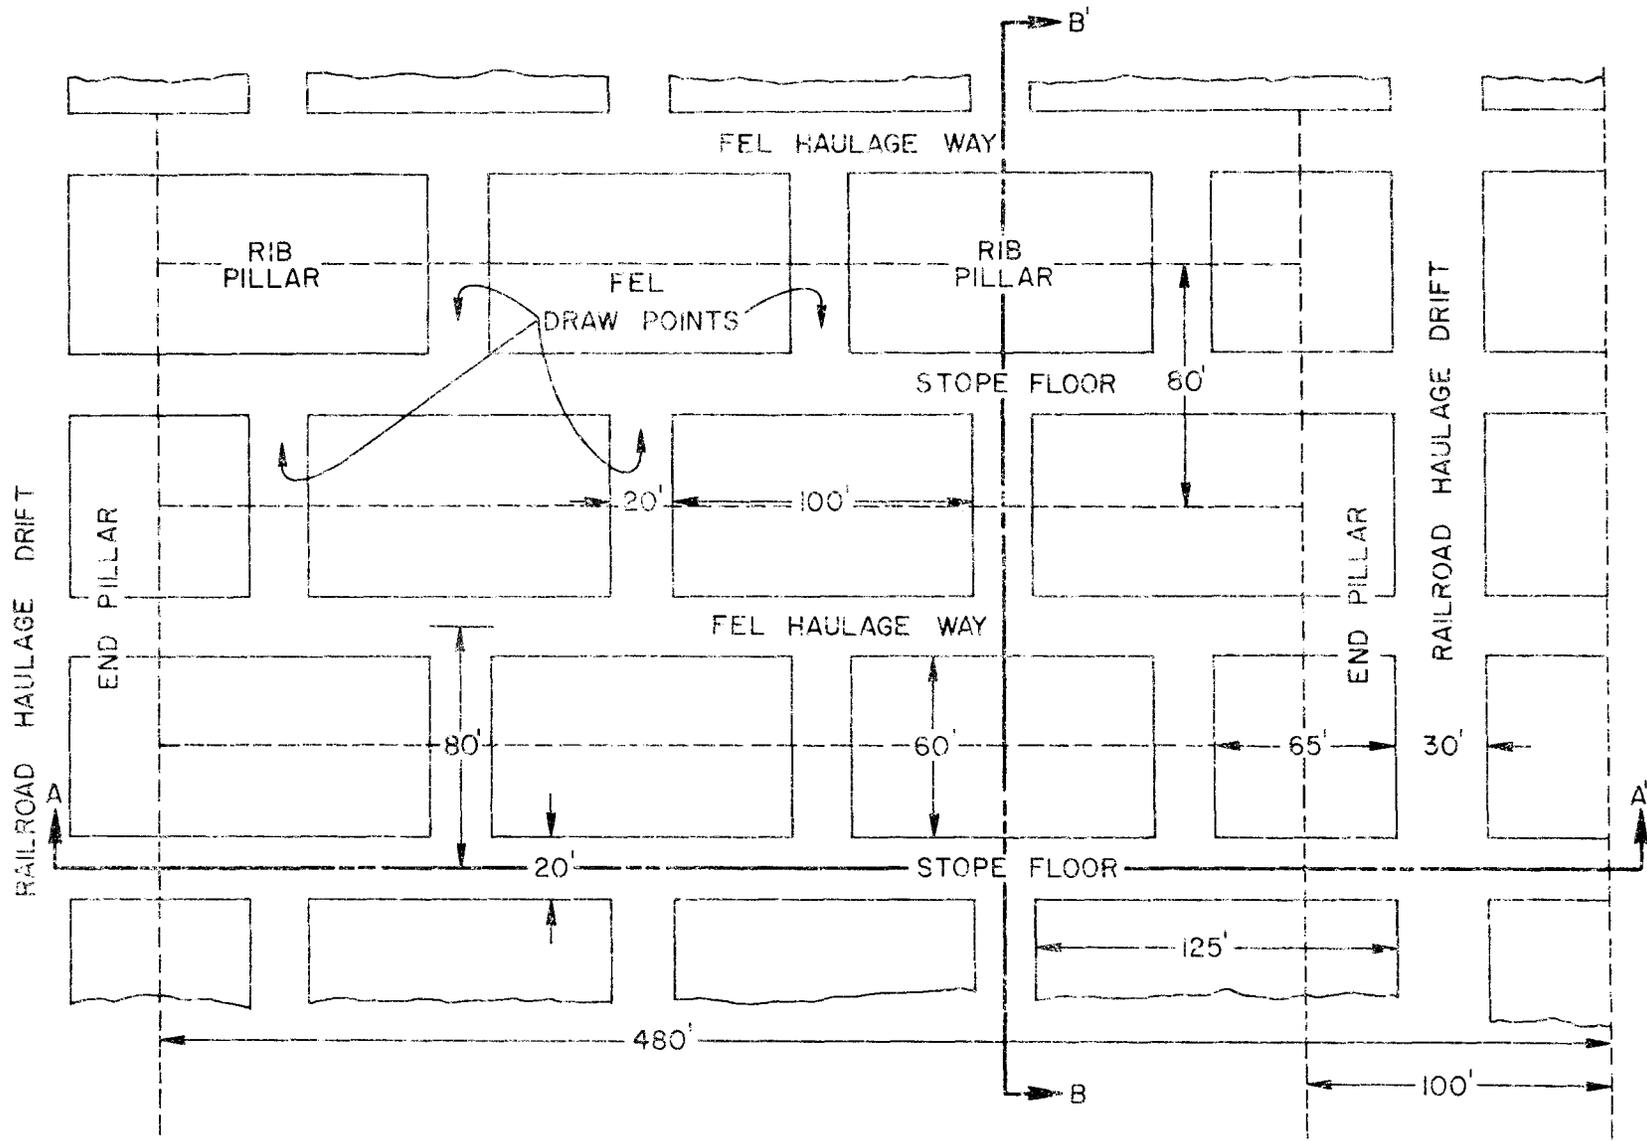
Plan View of Haulage Level, Sublevel Stoping with Full Subsidence
